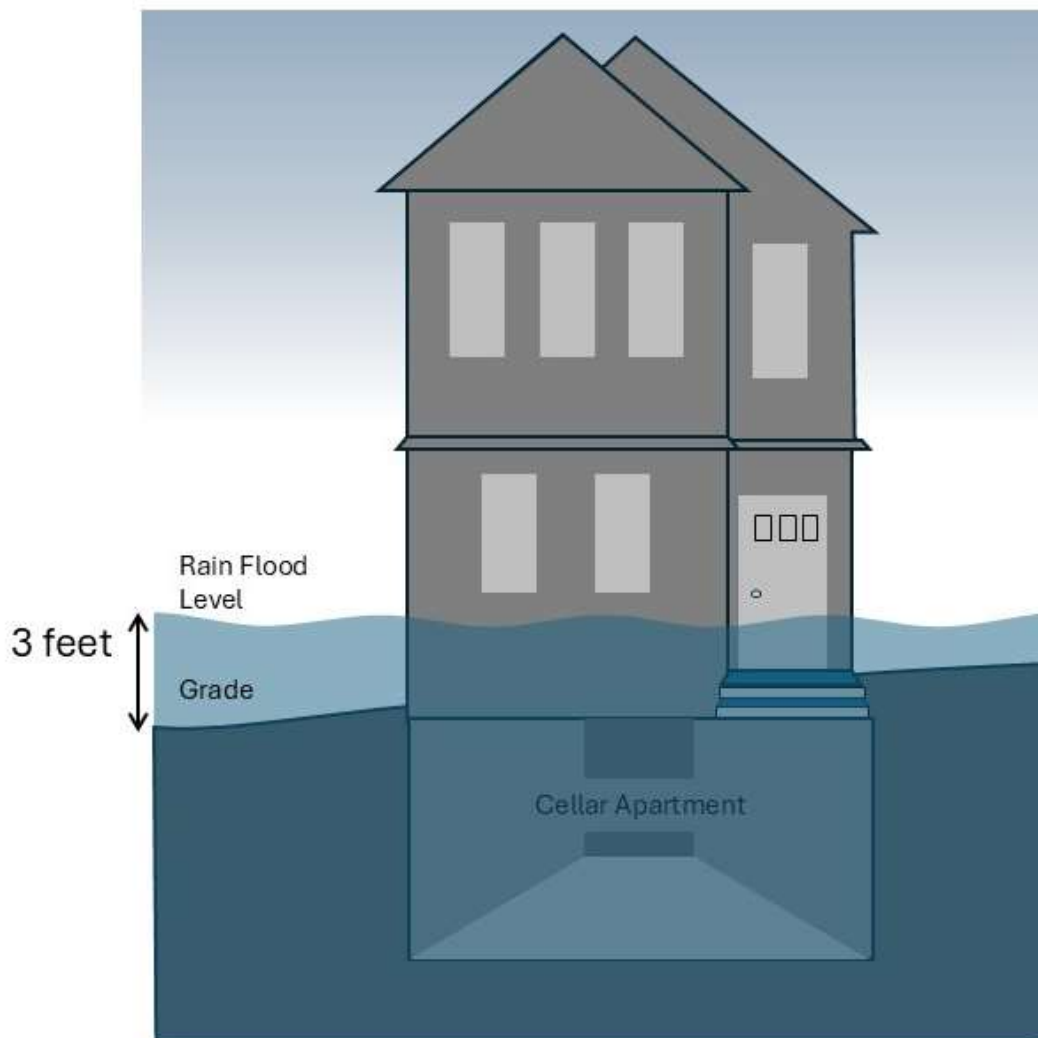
No way out of a below-grade apartment in a flood: Examination of deaths in an apartment in Queens during Ida showed that flooding in the yard meant water had risen over the ceiling elevation of the cellar apartment. The foundation wall collapsed suddenly, inundating the apartment and killing the occupants almost instantly. Witnesses upstairs and family outside did not even know the wall had collapsed, and only realized what was wrong after it was too late.
